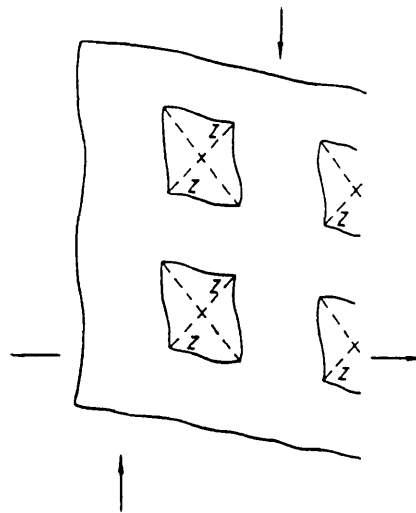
Distortion mode of wall with openings under sagging (after Rausch, 1955).
